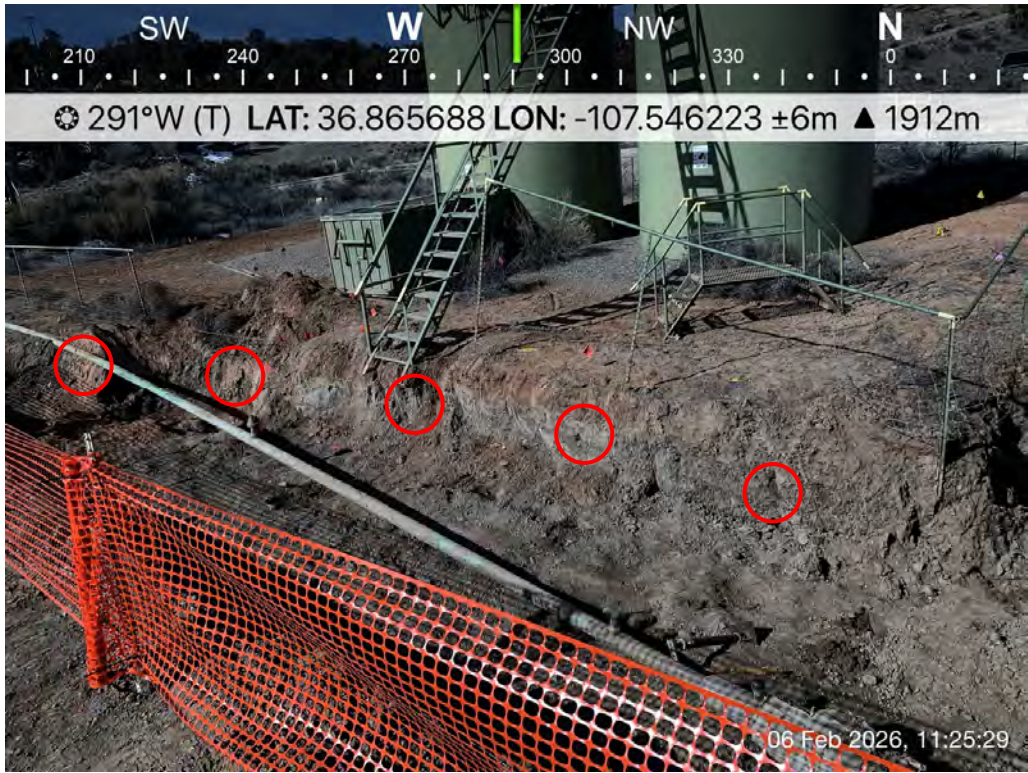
SS16 collected as a 5pct sample from the northwest sidewall of the POR excavation.
